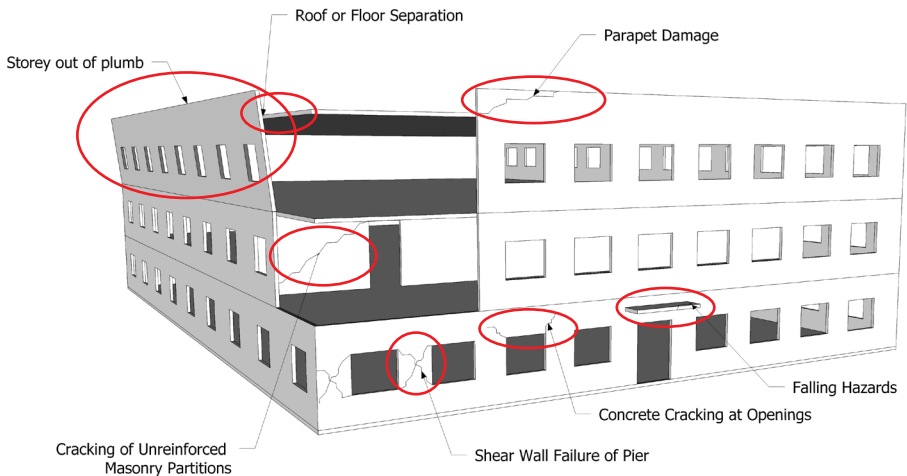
Typical damage areas in reinforced concrete or masonry structures
